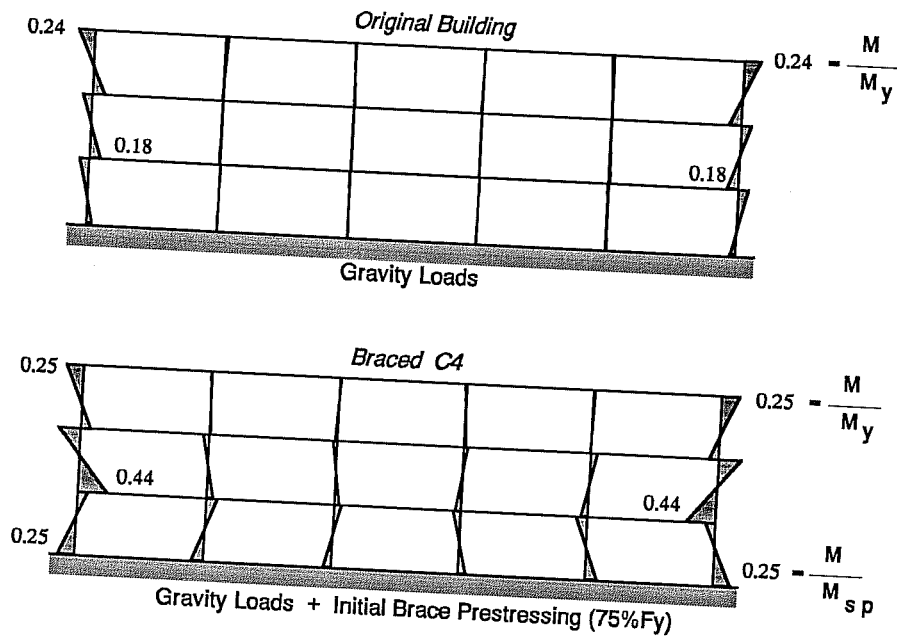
Effects of initial brace prestressing on the bending moment distribution in perimeter frame columns. Original building and braced structure, bracing config. C4 with initial brace prestressing of 75% of brace yield strength.
